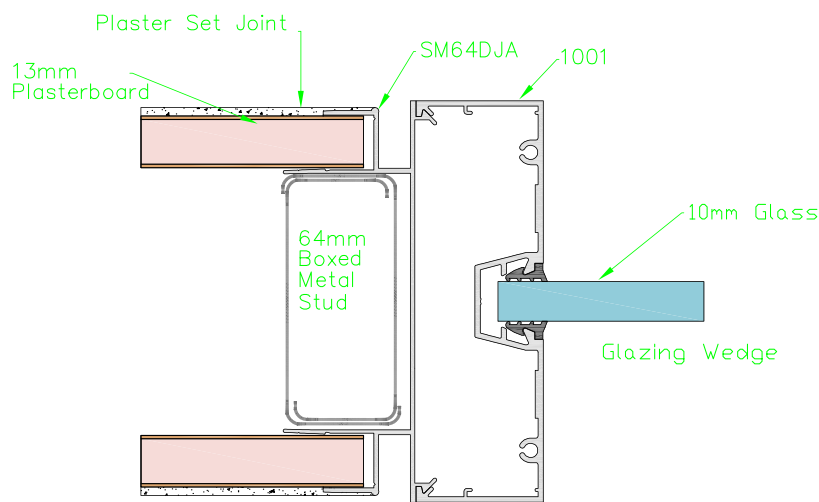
| Horizontal Section Drawing of 1017 Used with Glazing Section at Wall
